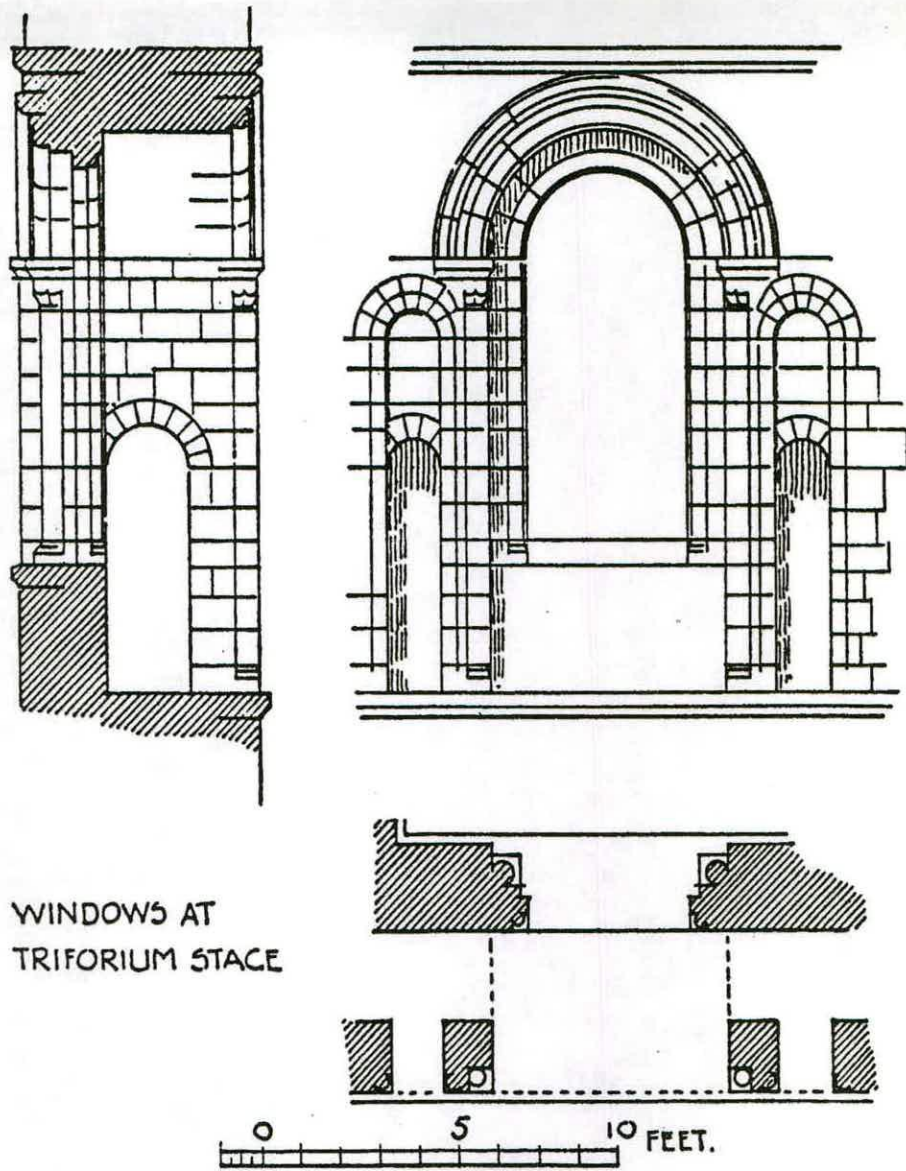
Elevation and section drawings of one of the south transept windows, showing the triple-arch arrangement and wall-passage.
